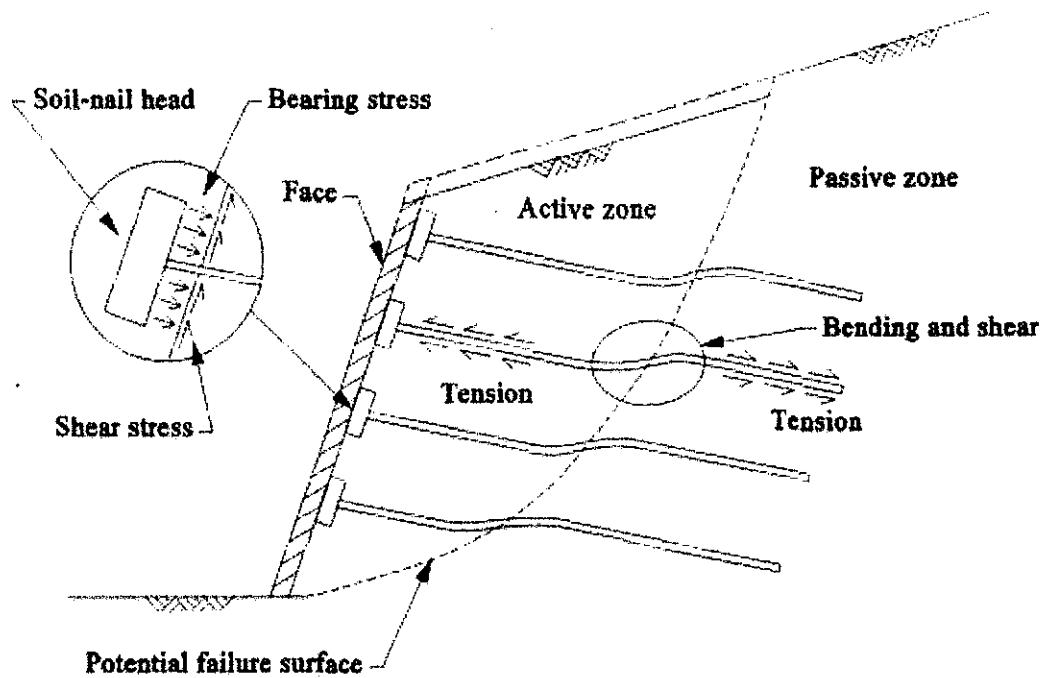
Two zones model of soil nailed system (GEO,2006)
